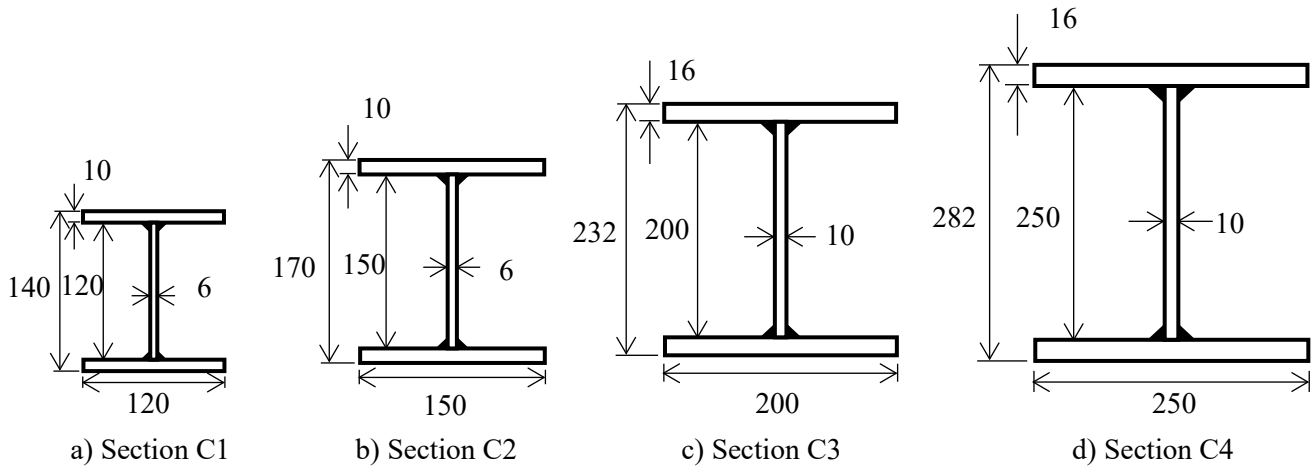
Cross-sectional dimensions of S690 welded H-sections
